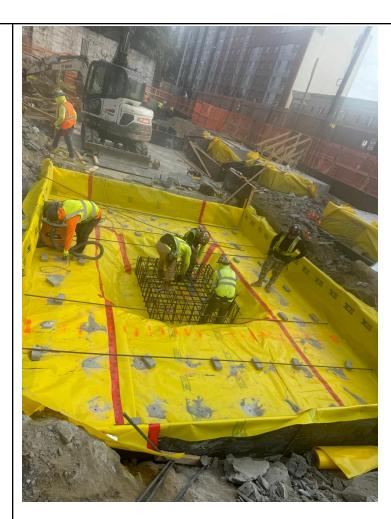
Construction personnel putting up the rebar at the elevator pit.
